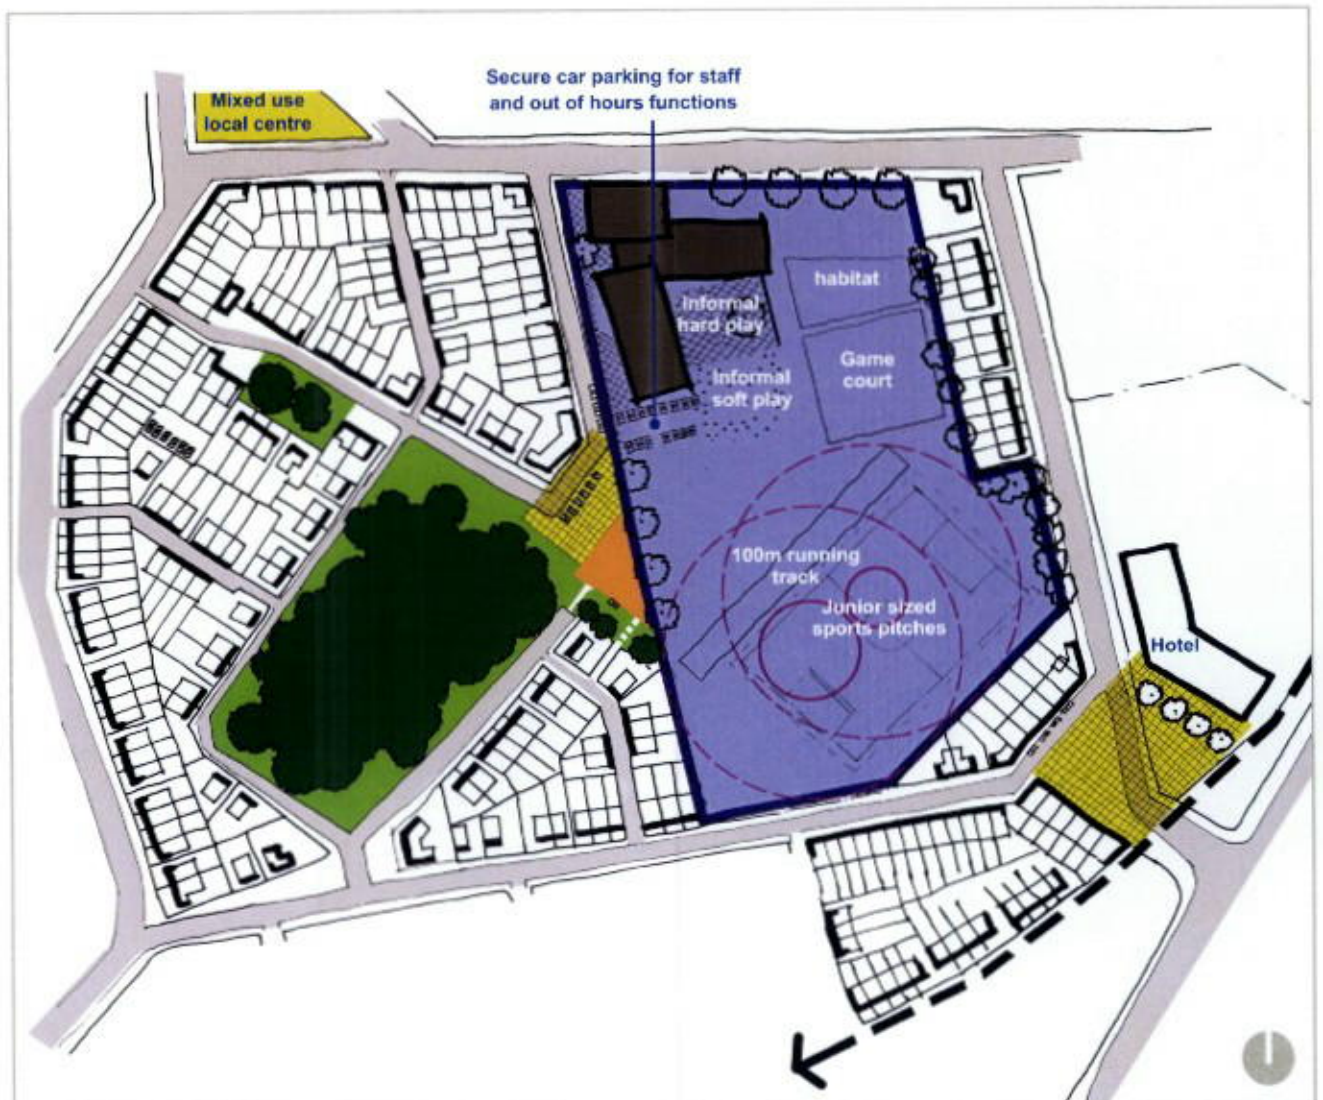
Illustrative proving layout of primary school and surrounding area
